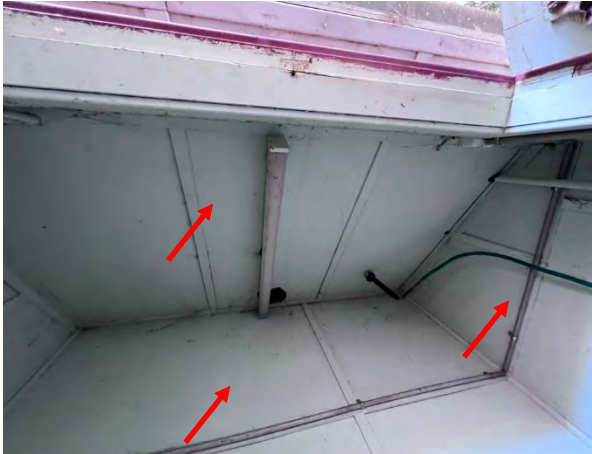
Old Nurses Home – Internal of southern plant room – asbestos fibre cement sheet ceiling lining
